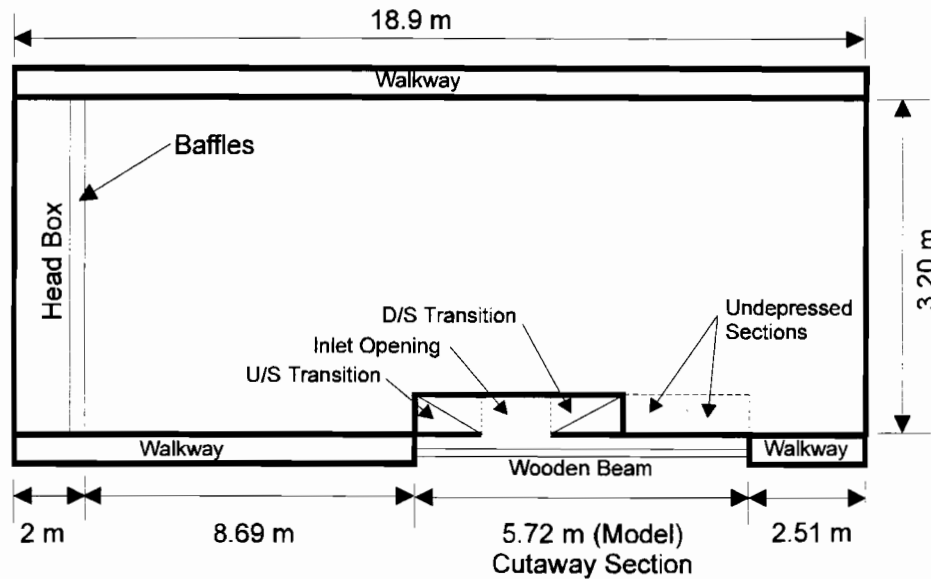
Plan View of Model Illustrating Modular Curb Inlet Construction
